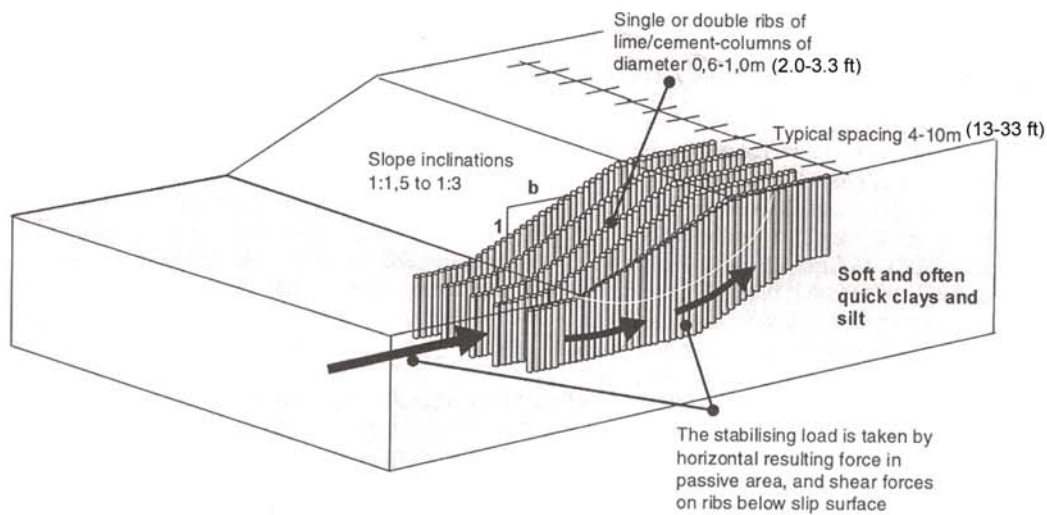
Slope stabilization with lime-cement columns (Watn et al. 1999)
